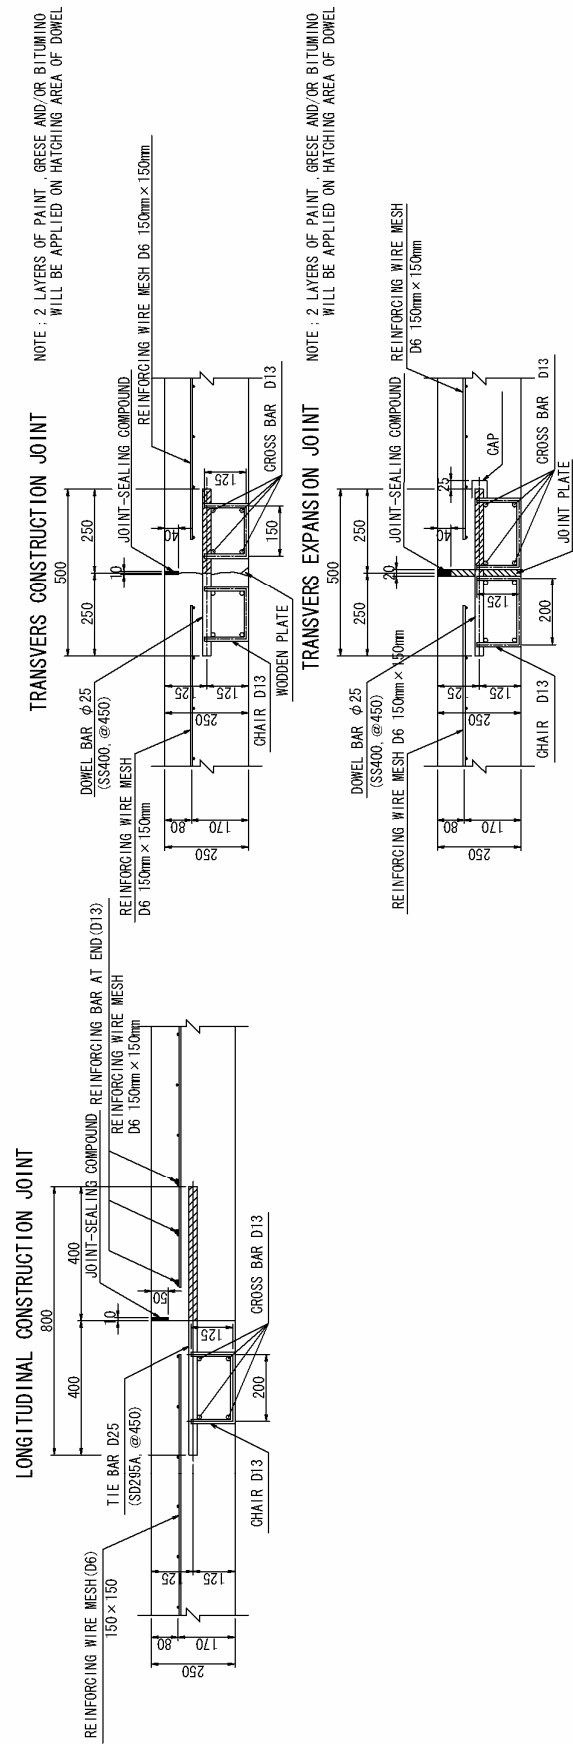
(30) Road Pavement Structure in Port of Namibe
